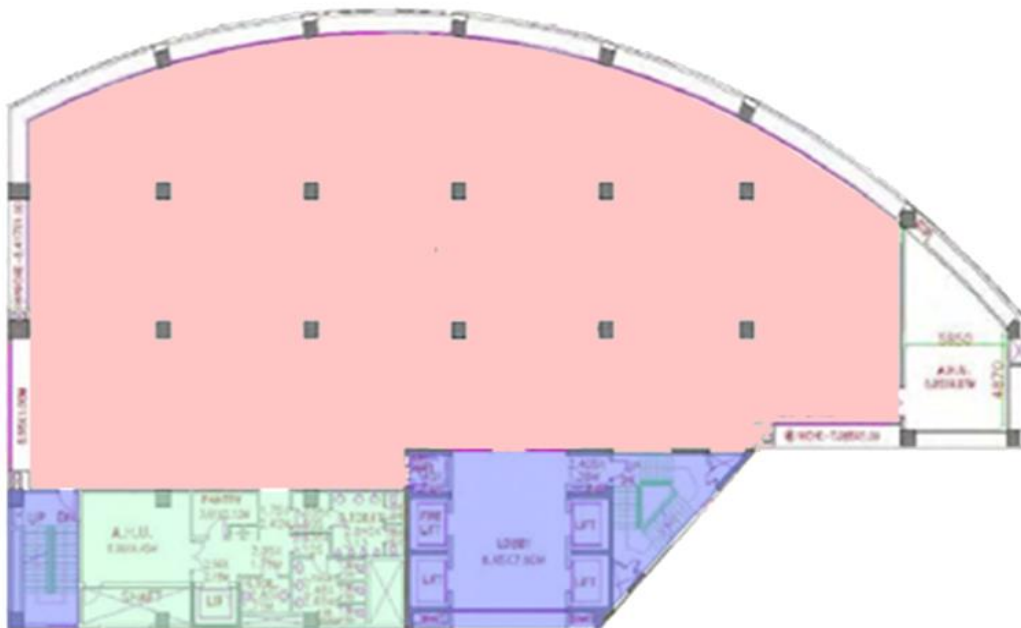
FLOOR PLAN OF THE RAHEJA TOWERS ((“RAHEJA TOWER | BLOCK G, PLOT NO. C-30,, | MUMBAI OFFICE PROPERTIES” 2009.)
